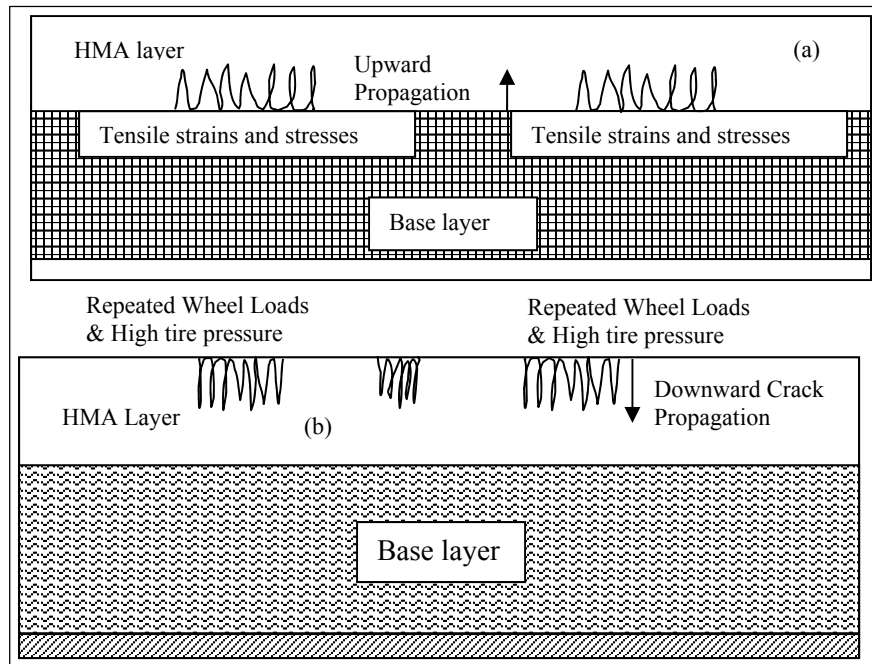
Fatigue cracking types: (a) Bottom-up (b) Top-down
